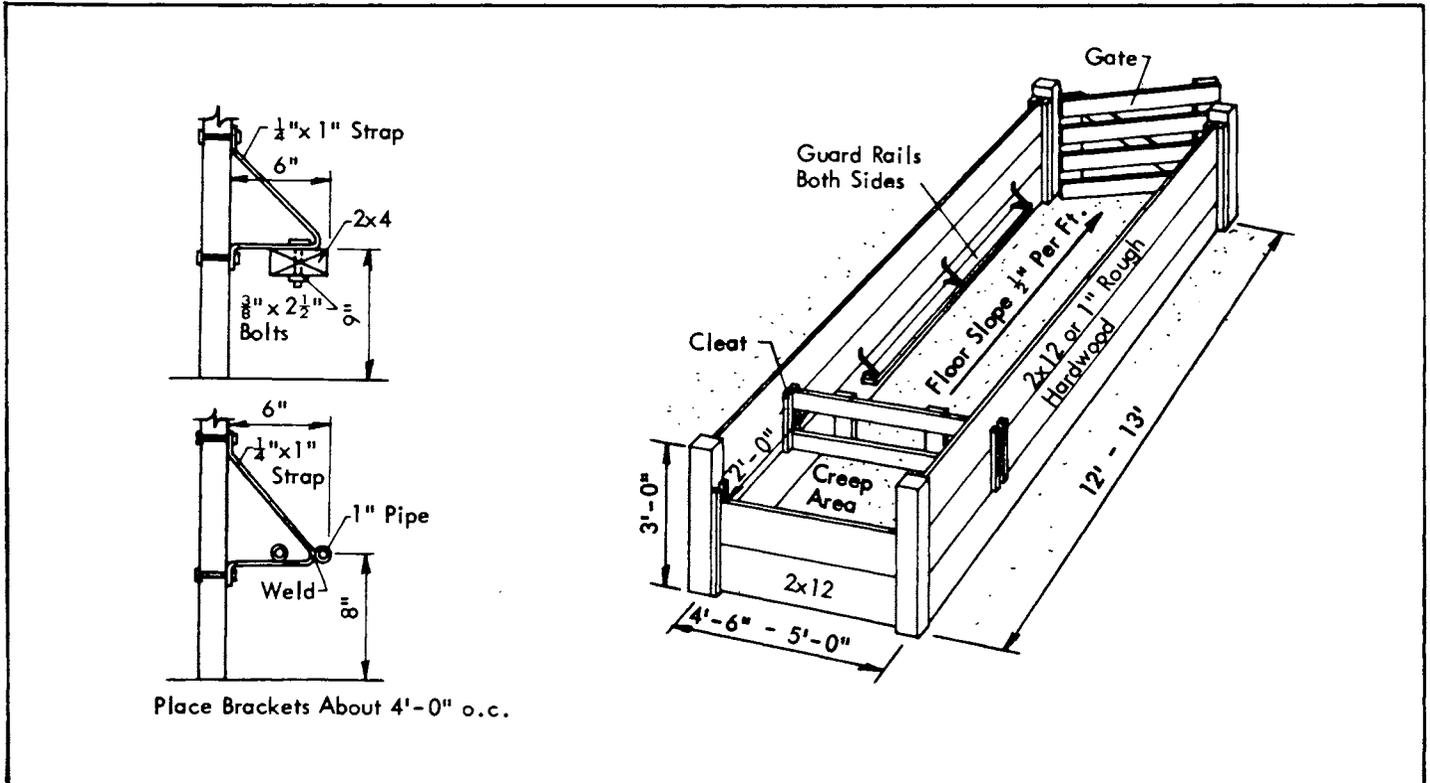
Locate along building wall for confined finished, or along drive or fenceline. Provide roof for outdoor use.
